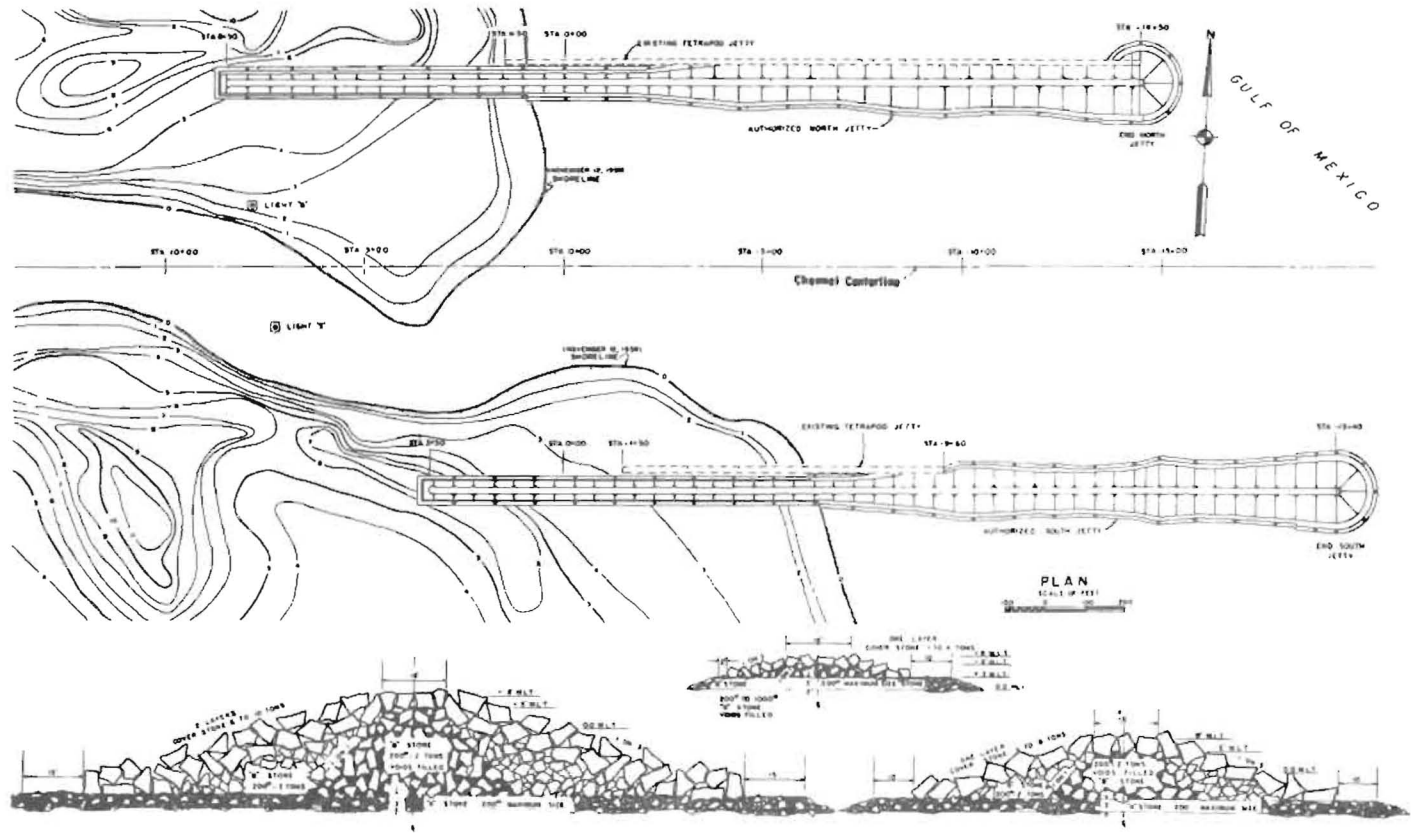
Typical jetty cross section and plan (Hansen, 1960).
